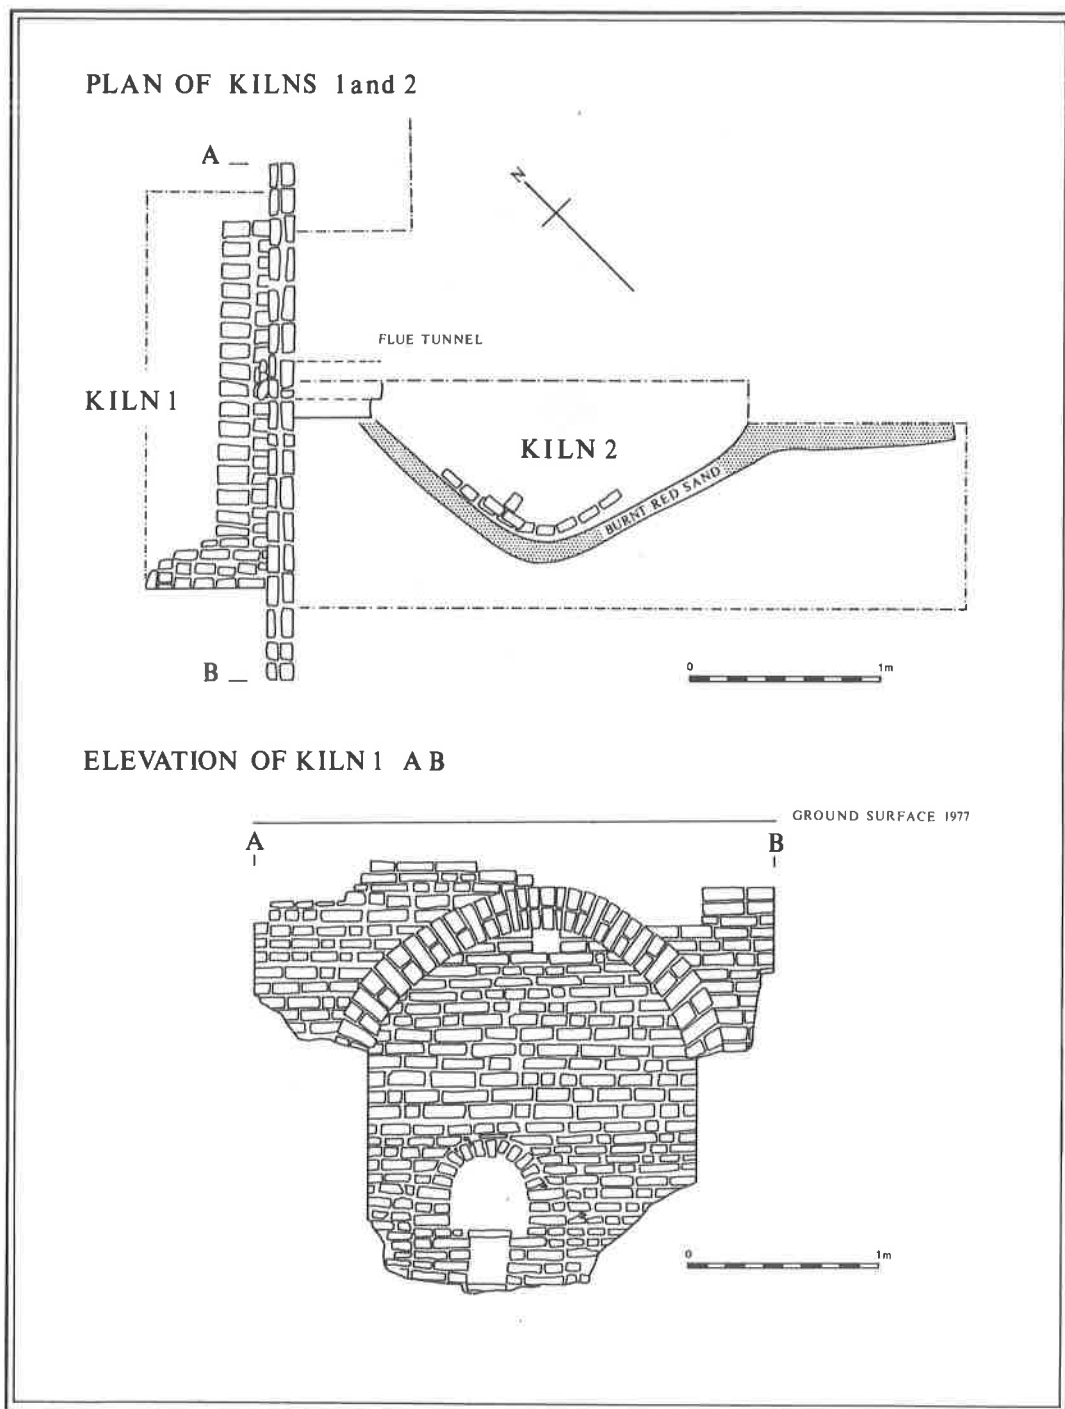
Upper: plan of Kiln 1 and Kiln 2. Lower: elevation of Kiln 1.
